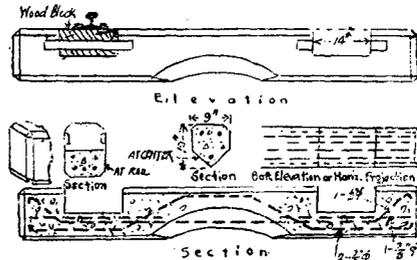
THE "INDESTRUCTIBLE" TIE IS A REINFORCED-CONCRETE BEAM
